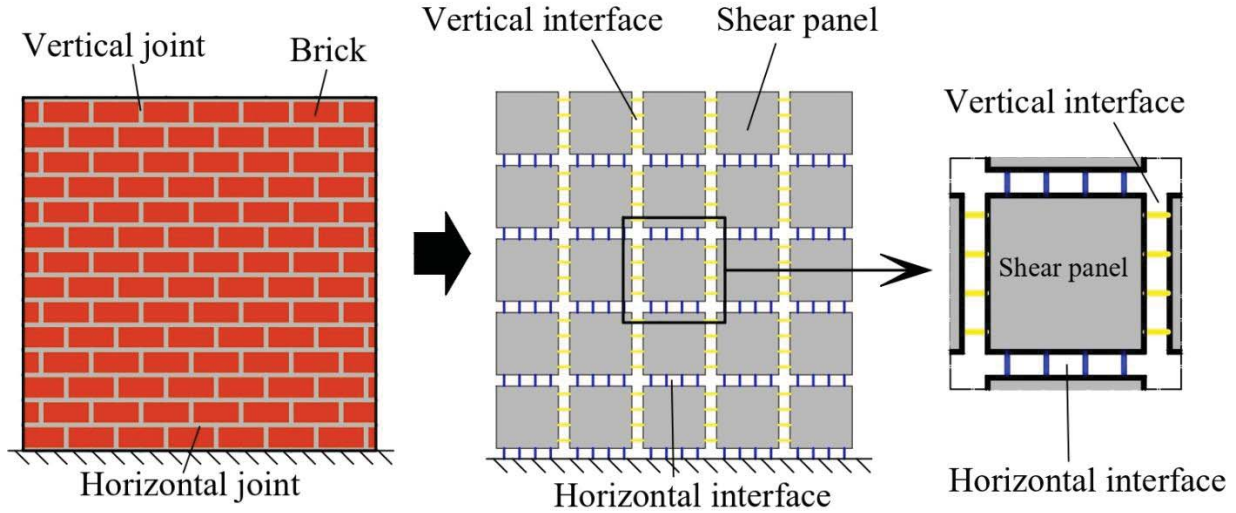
Real masonry wall (left); numerical representation with discrete elements (center); Single discrete element (right)
